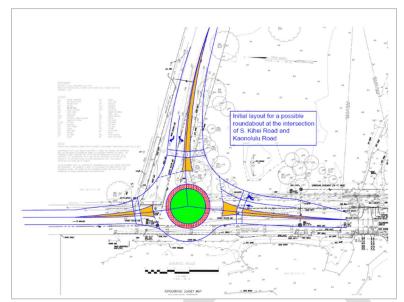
Proposed Roundabout at South Kihei Road and Kaonoulu Street
